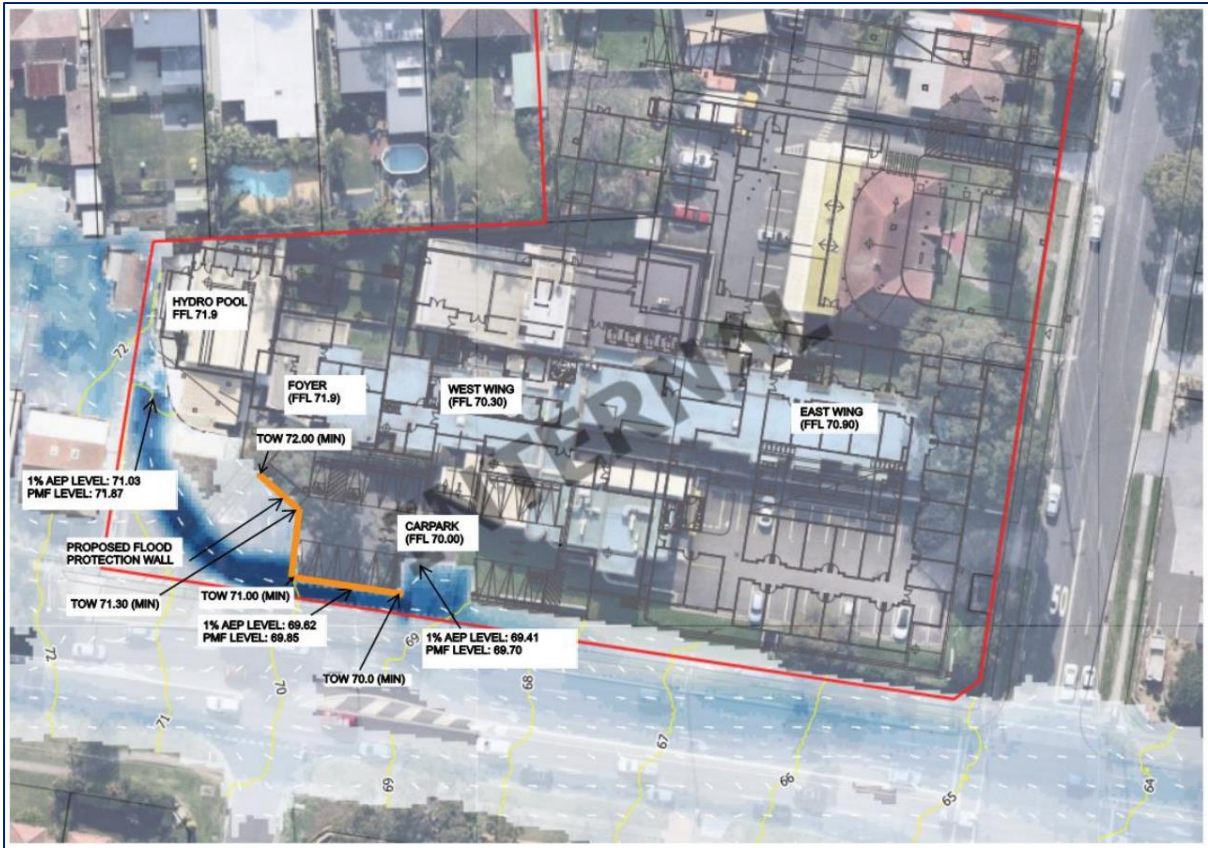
| Comparison of flood levels within proposed swale and proposed building floor levels (Source: EIS)
